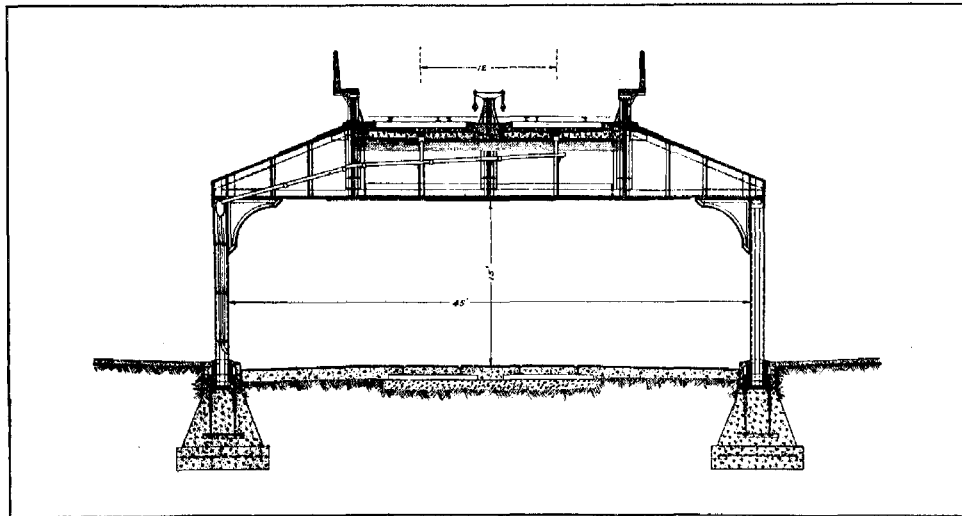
Double column ballasted deck elevated railroad--cross-section between stations (Philadelphia type).
